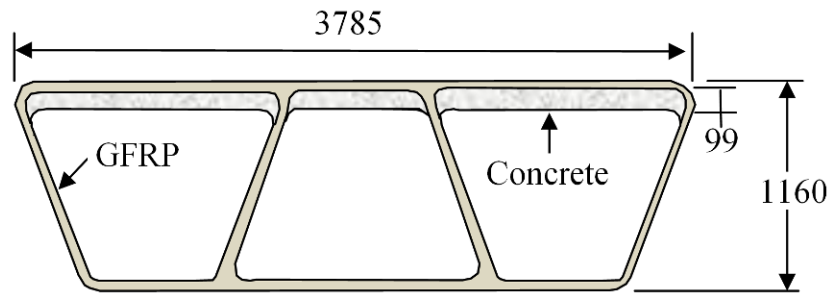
Hollow trapezoidal tubes partially filled with concrete (after [108])
